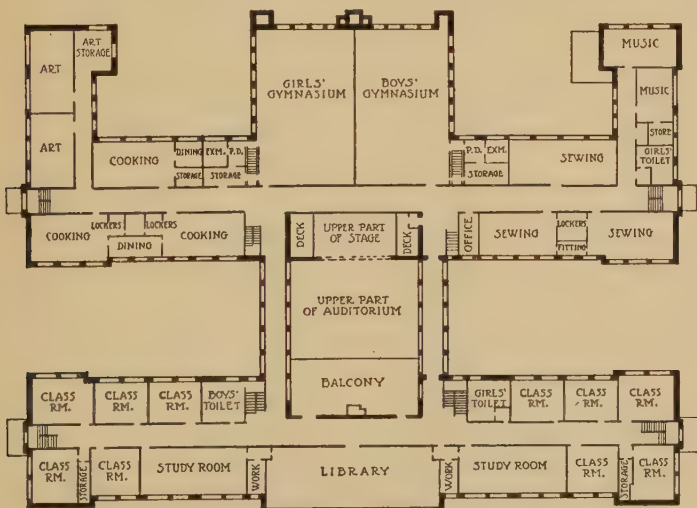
Second-floor plan, Carlos M. Cole Junior High School, Denver
